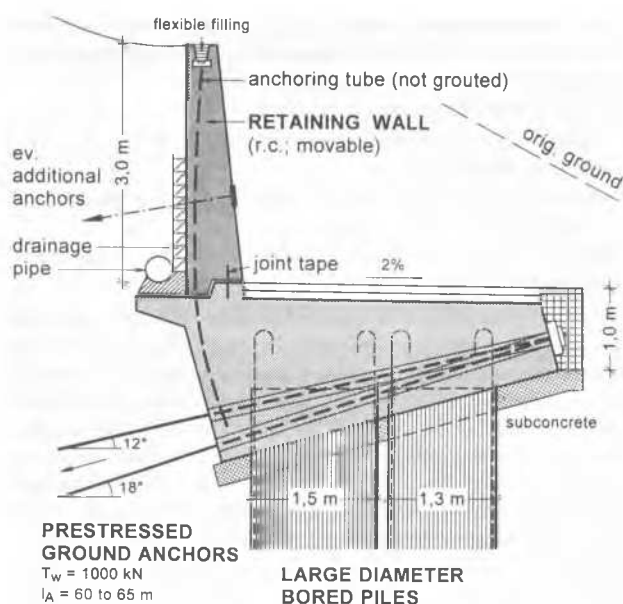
Top of a twin-pile wall in an unstable slope (deep seated failure planes and creep zone near the surface); heavily weathered and decomposed schists. Capping beam of the pile wall with movable reinforced concrete wall for lateral pressure reduction; precautionary features include the possibility of installing additional prestressed anchors. Capping beam used as permanent access way for slope monitoring.
